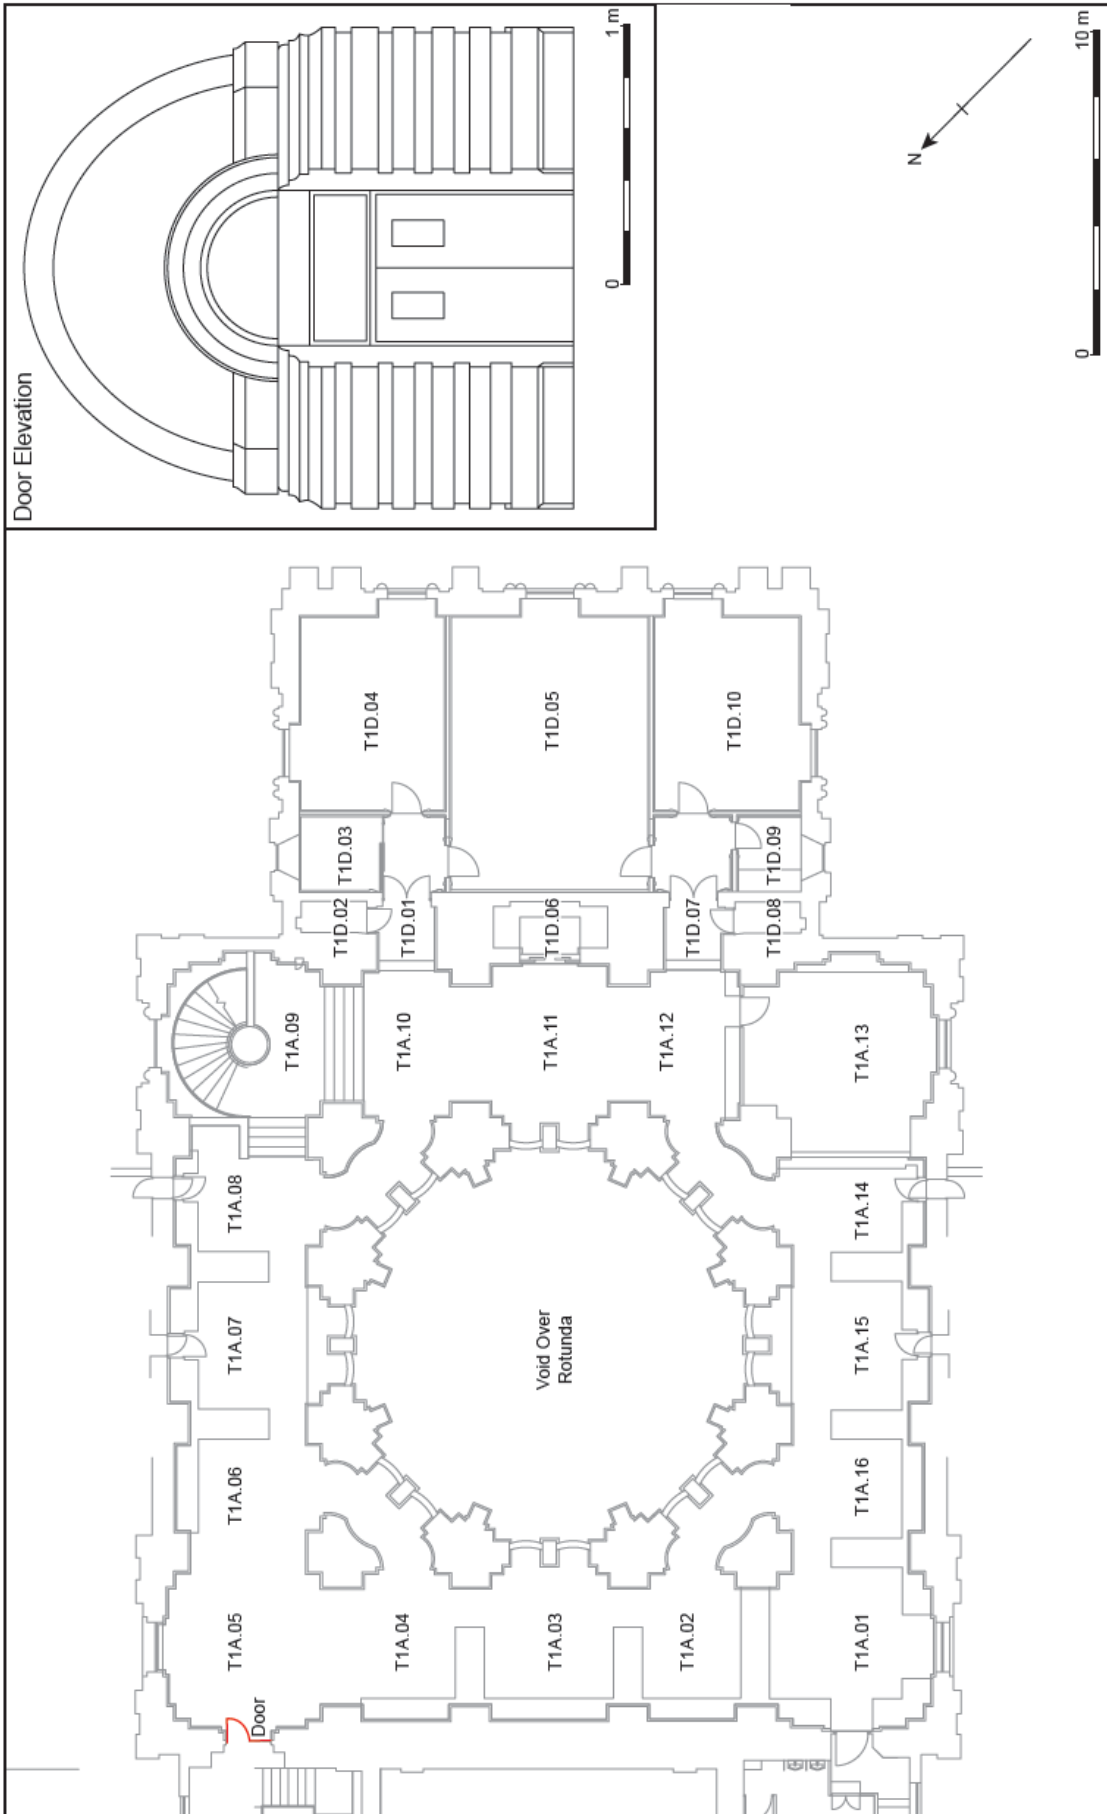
Upper Level Plan, Historic Fabric and Door Elevation
